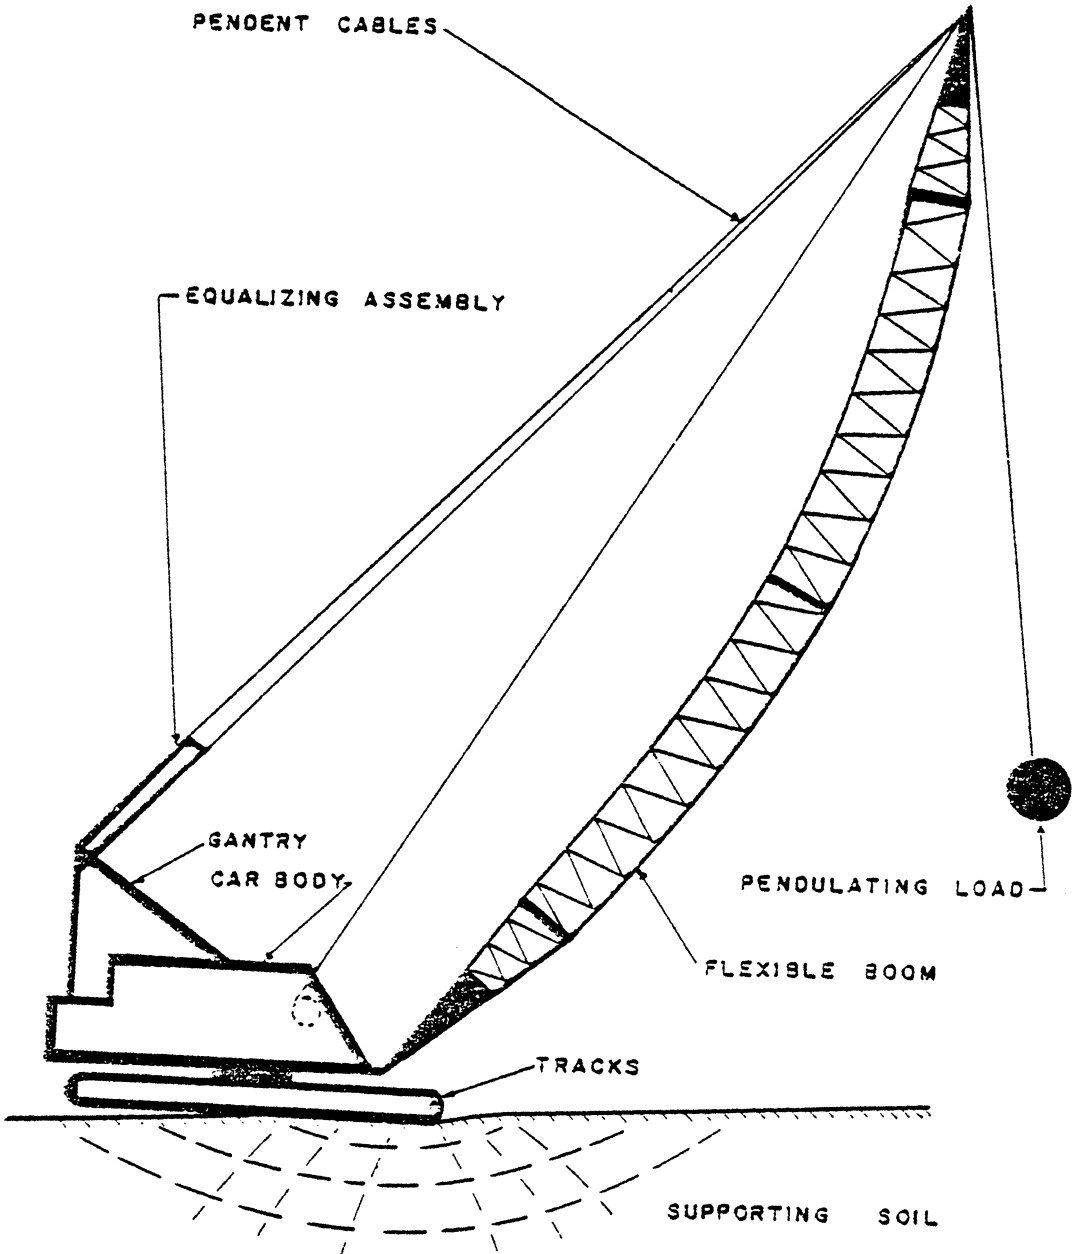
THE CRAWLER CRANE MODEL (REF. 2)
